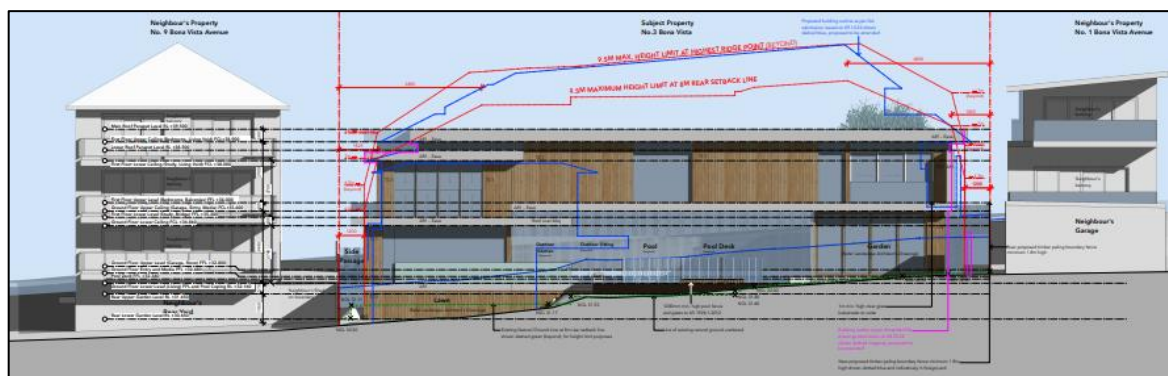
Eastern Elevation of subject Development (Rear of development) – 3-7 Bona Vista Avenue (Source: Dominic Levene)
